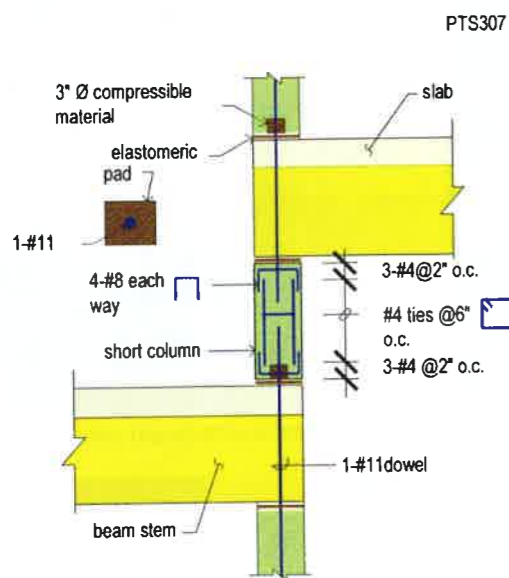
B-3 Hinge Creation at Short Ramp Columns of Parking Structures
